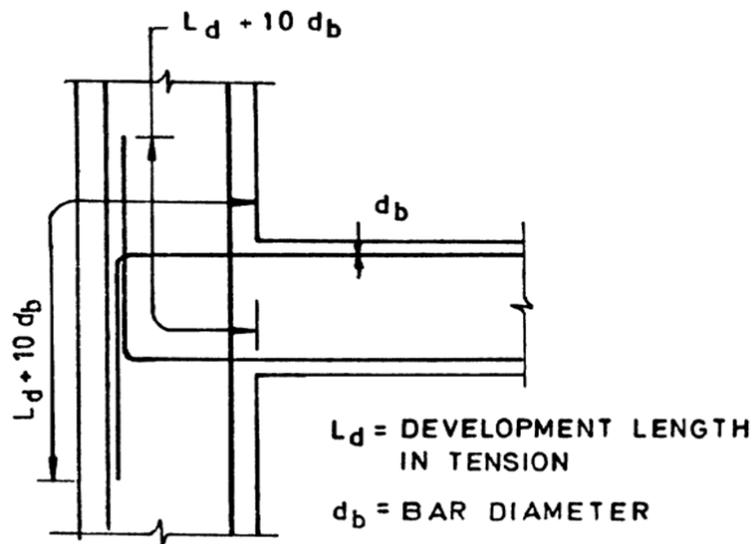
ANCHORAGE OF BEAM BARS IN AN EXTERNAL JOINT
